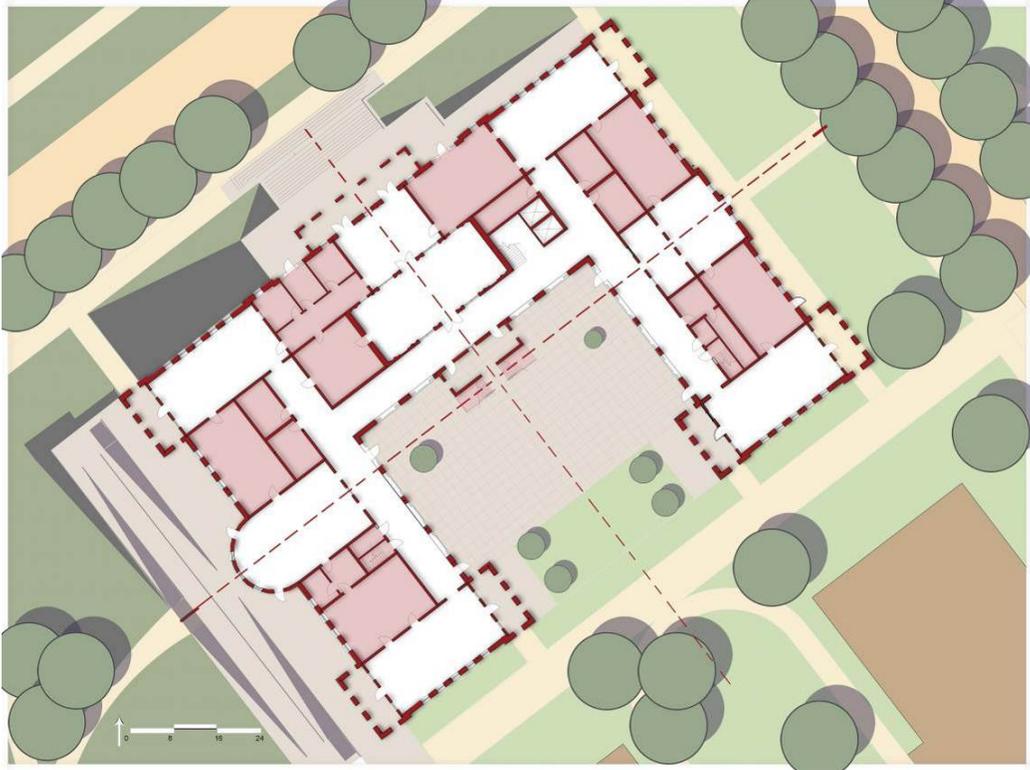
WFU Architecture School: Ground Floor Plan (source: Author)
